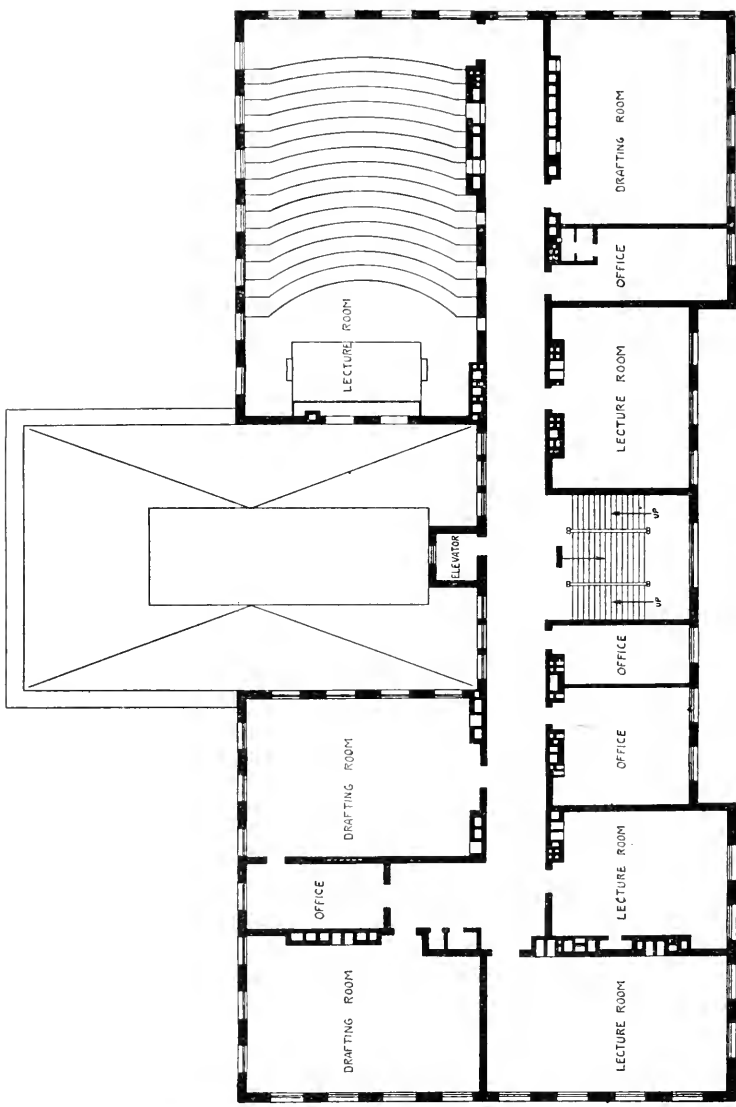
SECOND FLOOR PLAN OF THE R. E. OLDS HALL OF ENGINEERING.
